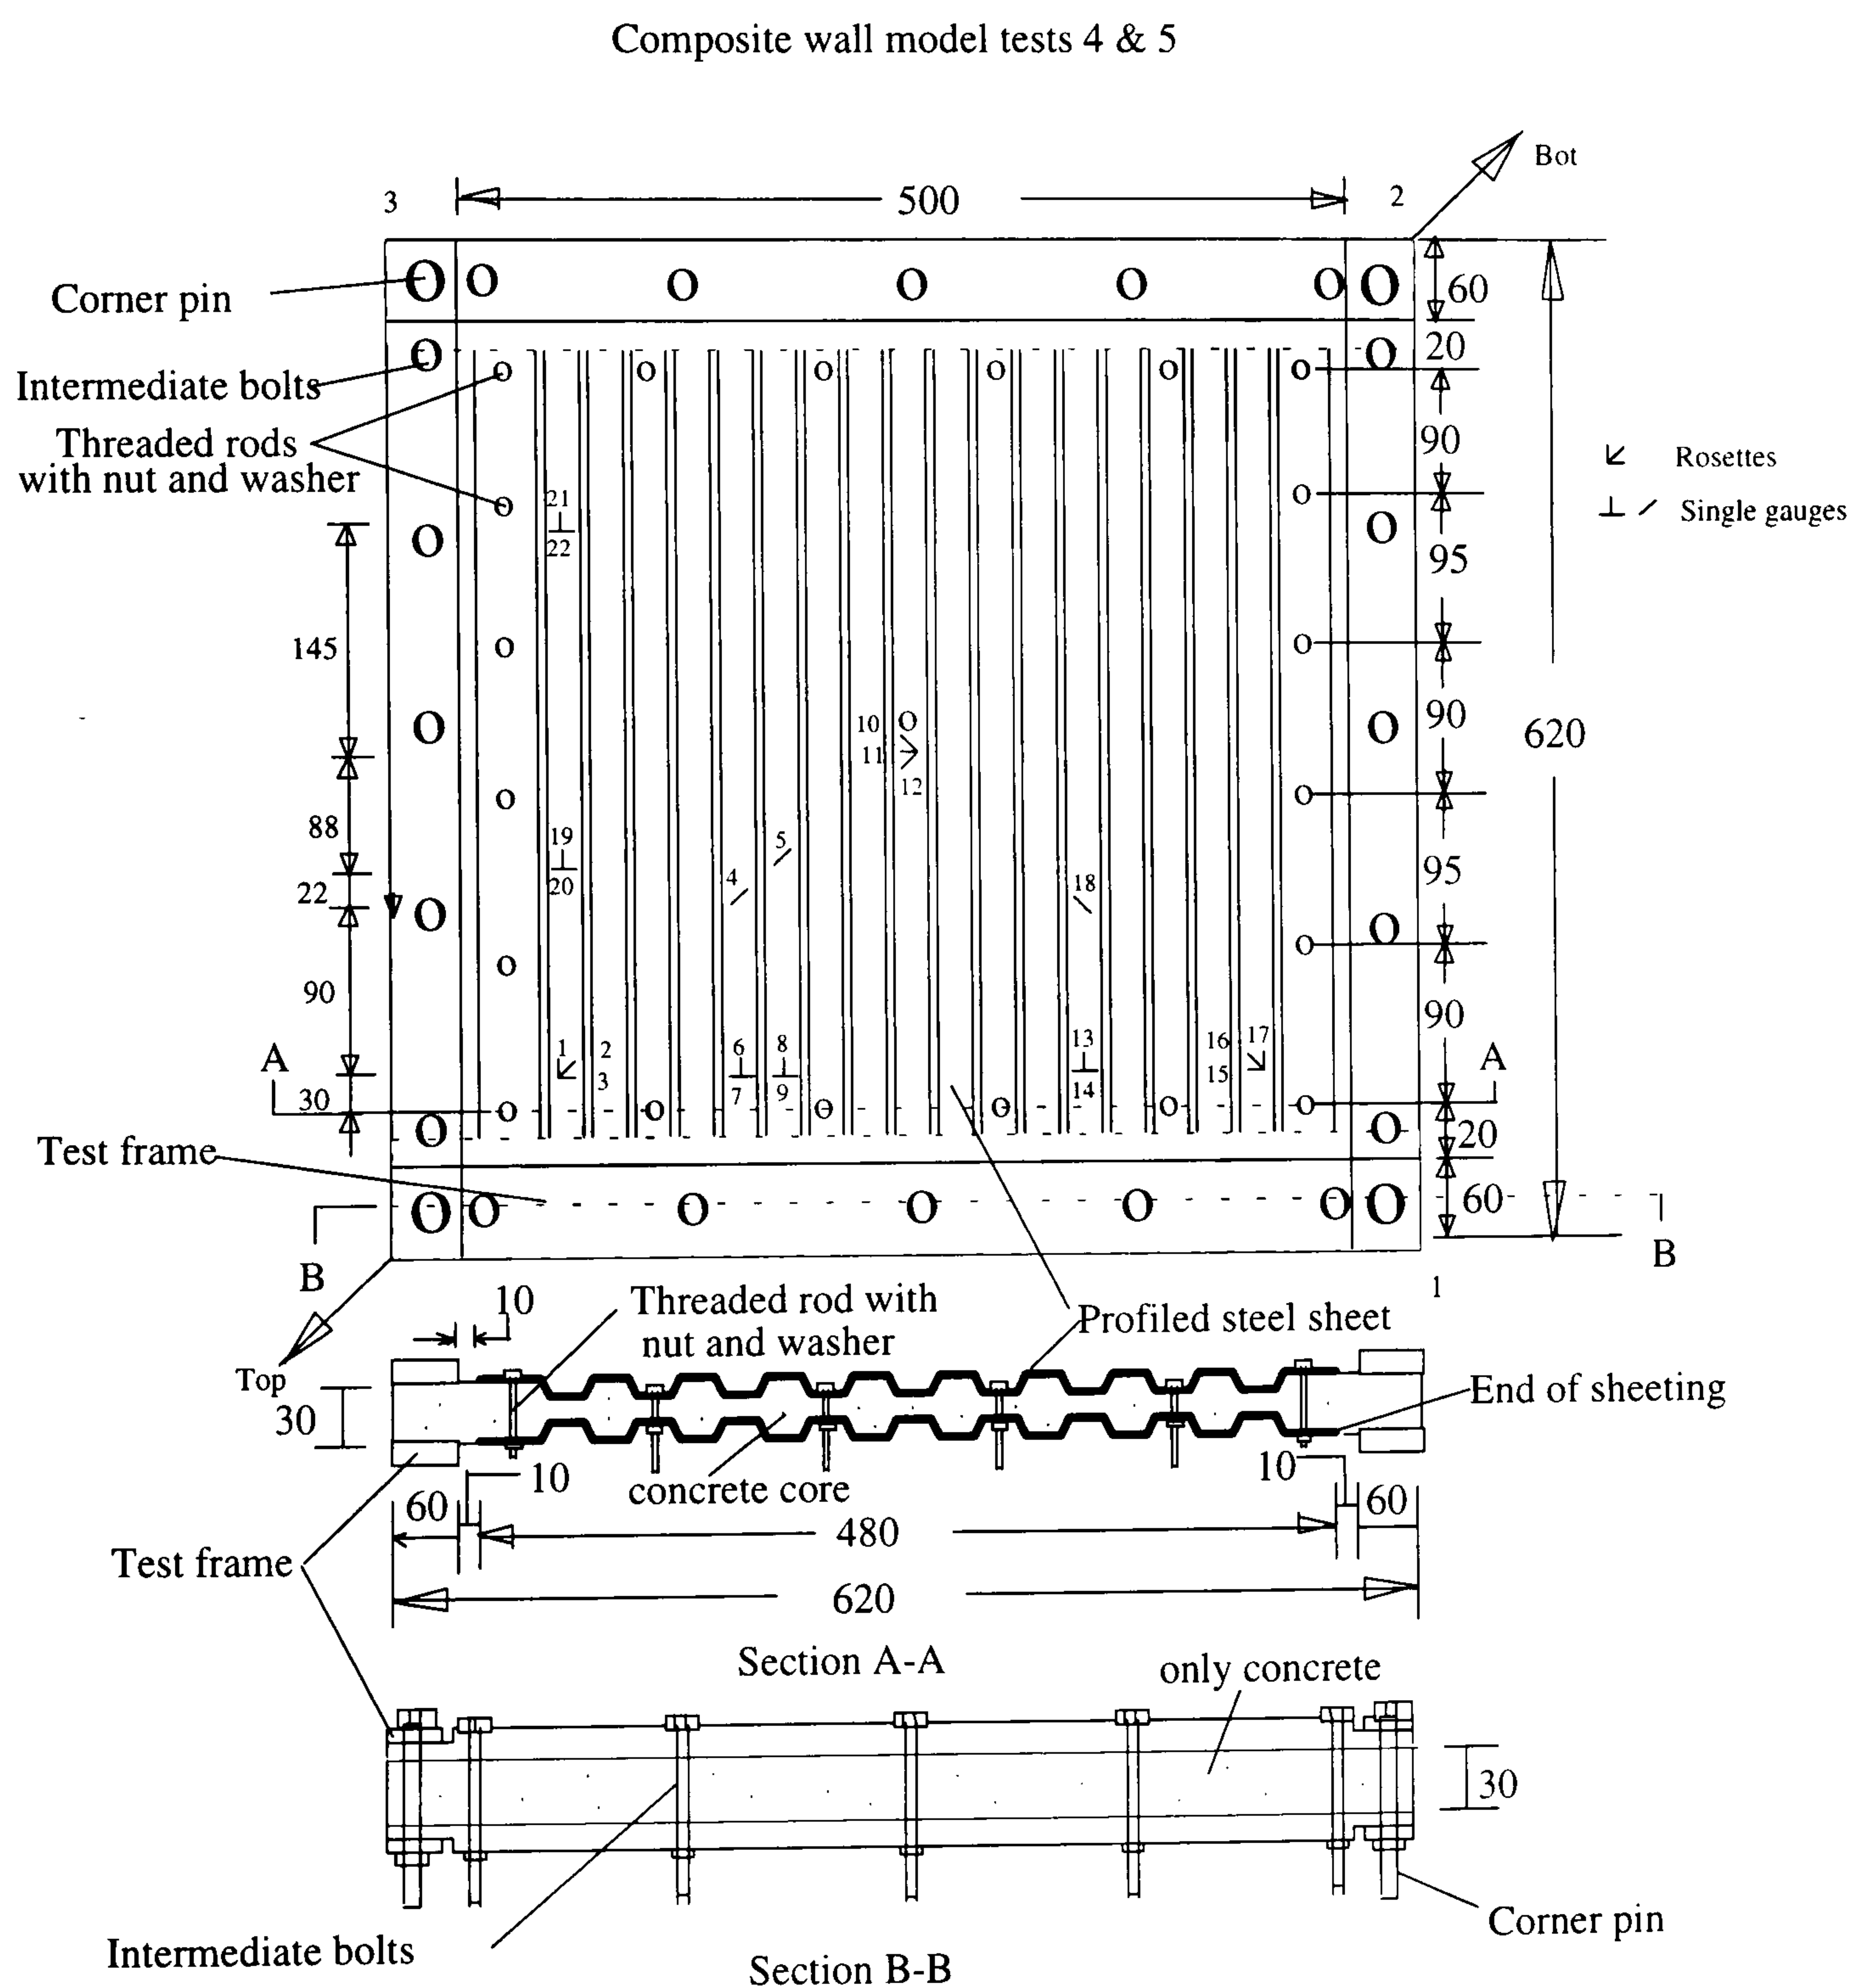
(a): Details and instrumentation of test panels 4 and 5
